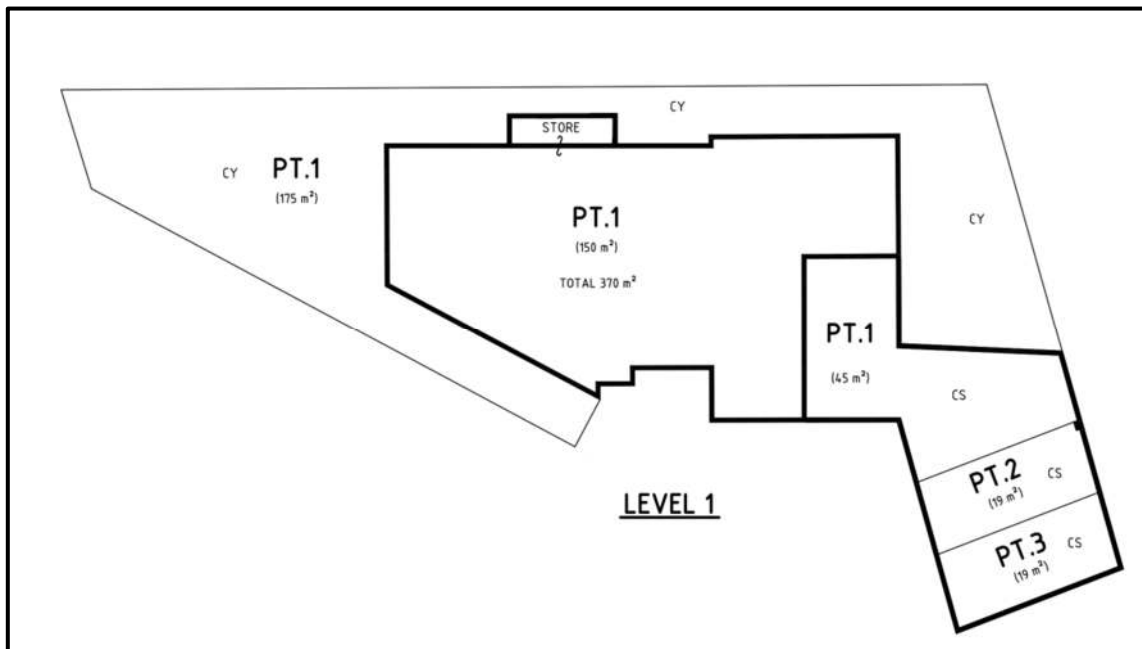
Strata Plan – Level 1 (Source: D Stutchbury, September 2022)
